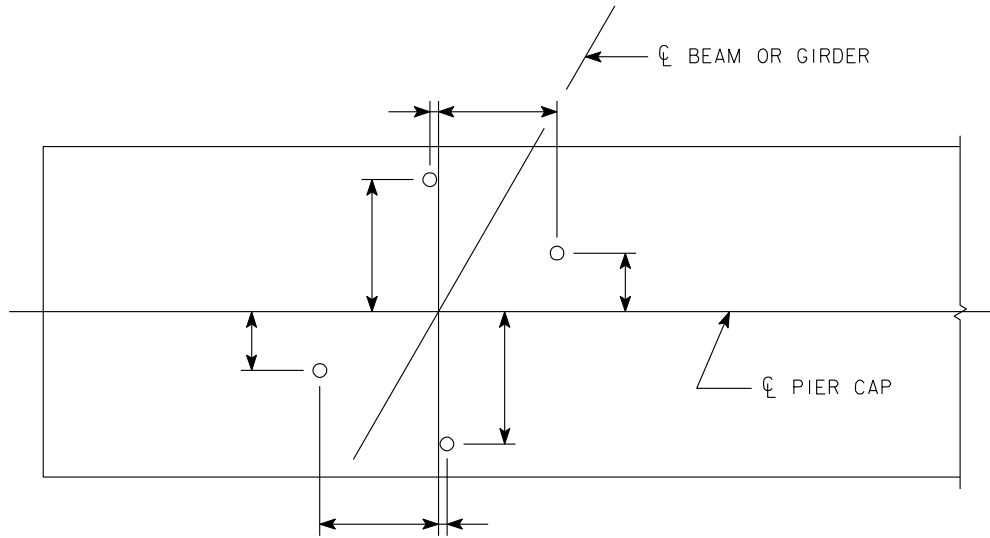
Anchor bolt dimensioning example
